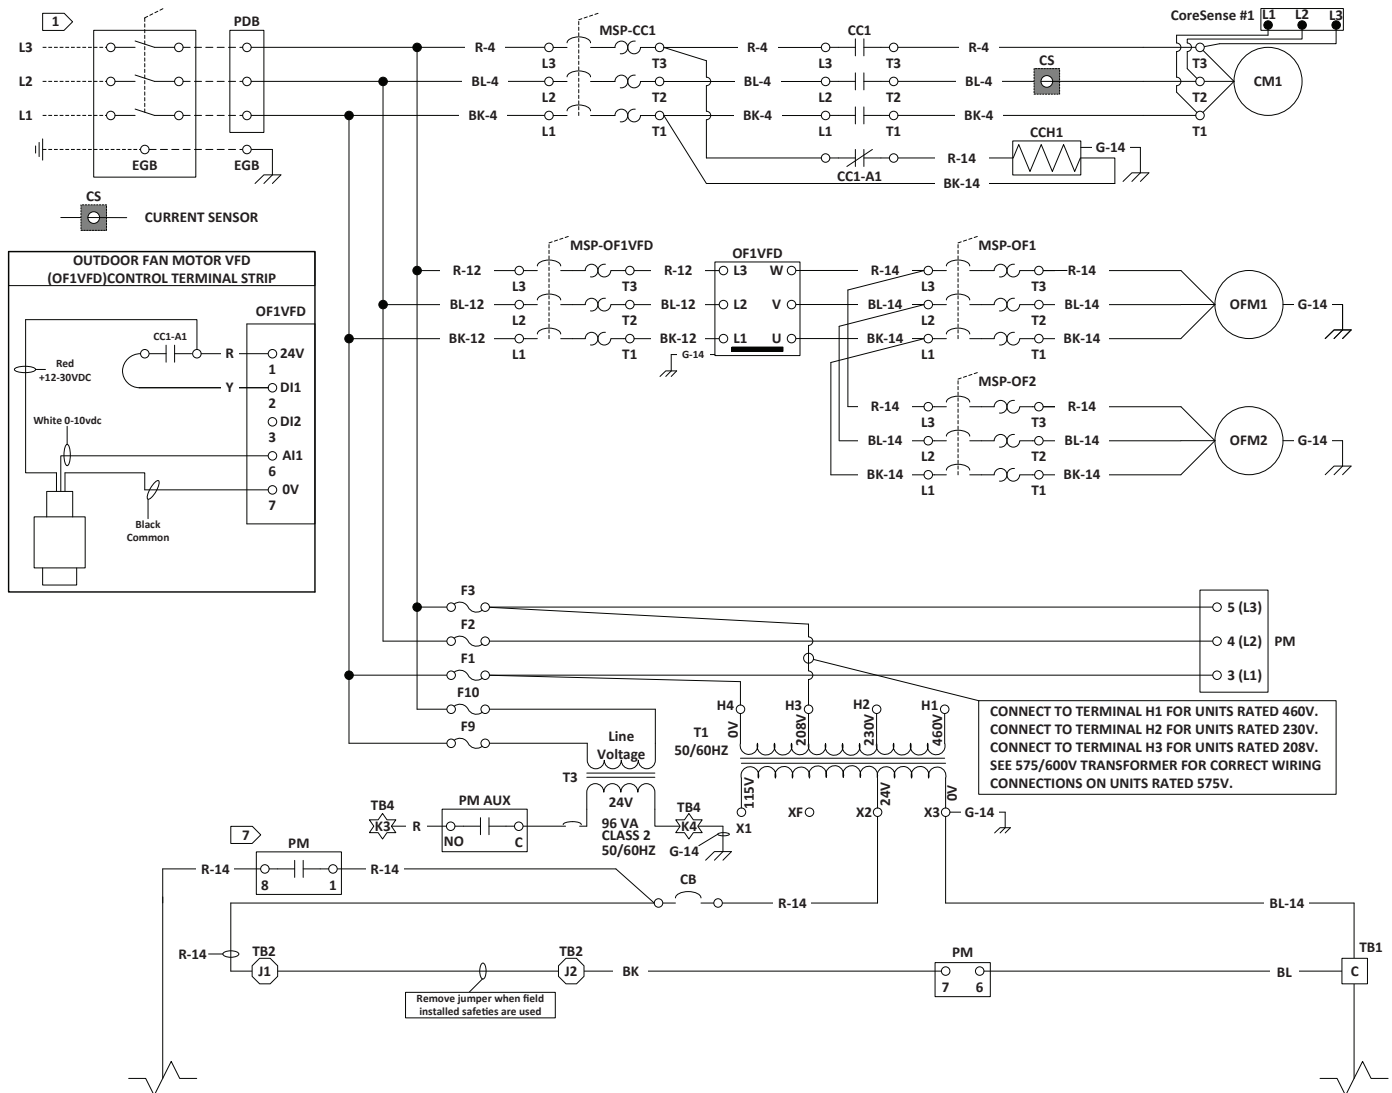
Example Electrical Wiring Diagram - Condensing Section, Cont.
